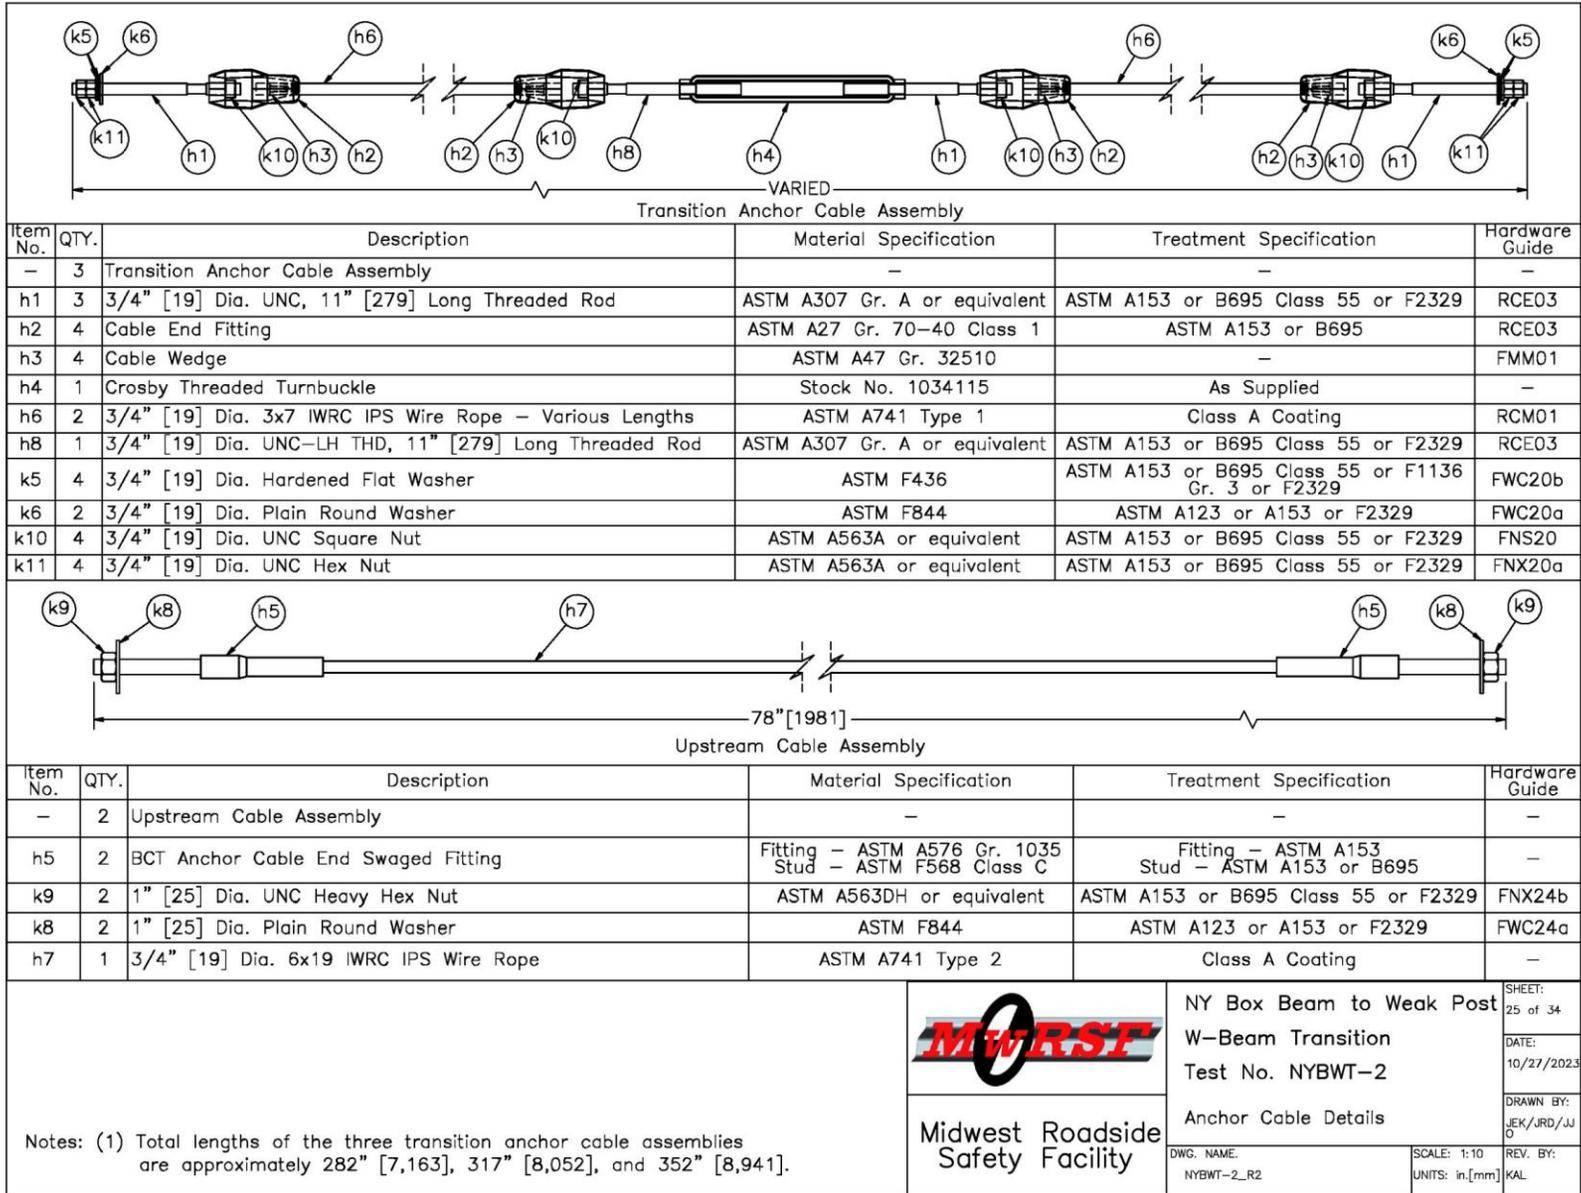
Anchor Cable Details, Test No. NYBWT-2
